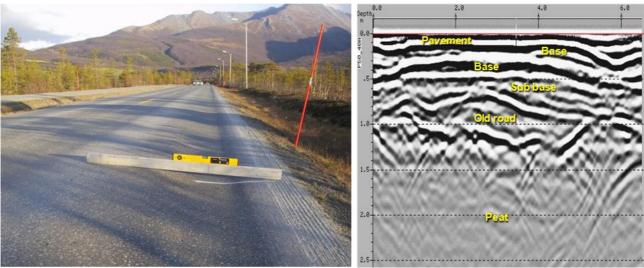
Settlement of a road shoulder on a widened road resting on peat soil, an example from Norway.
